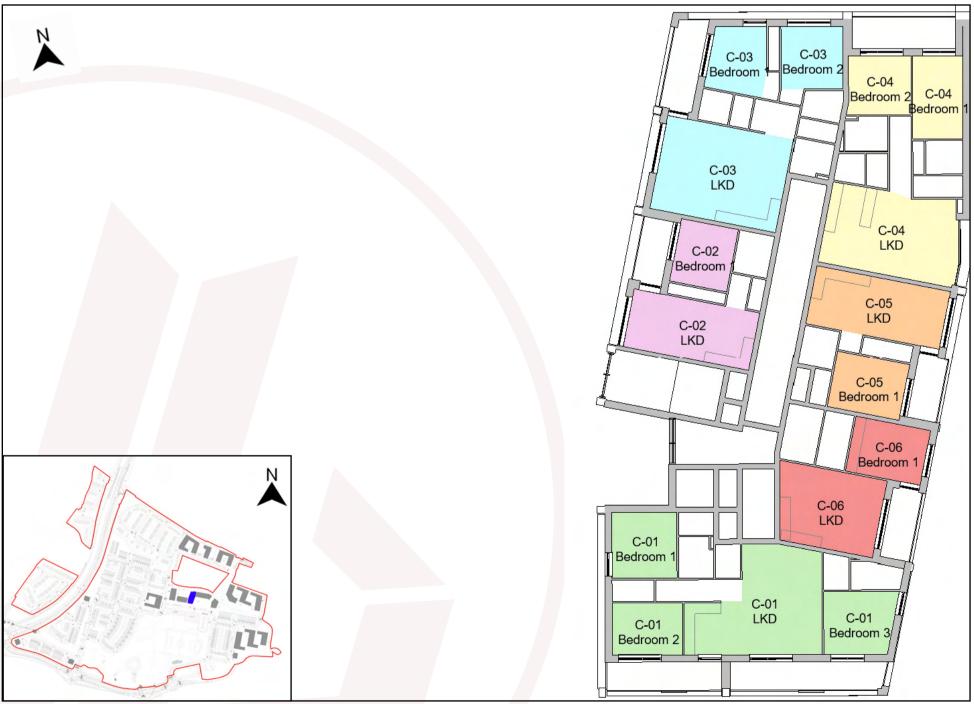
Keyplan highlighting the assessed building (L), Floor plan of assessed building (R).
